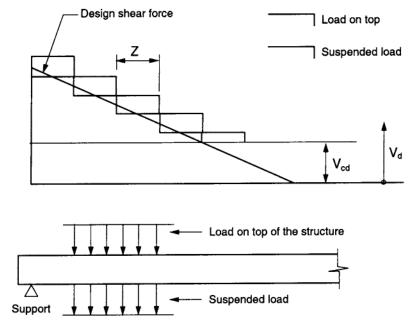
Curtailment of shear reinforcement by distributed load. Simplified method
